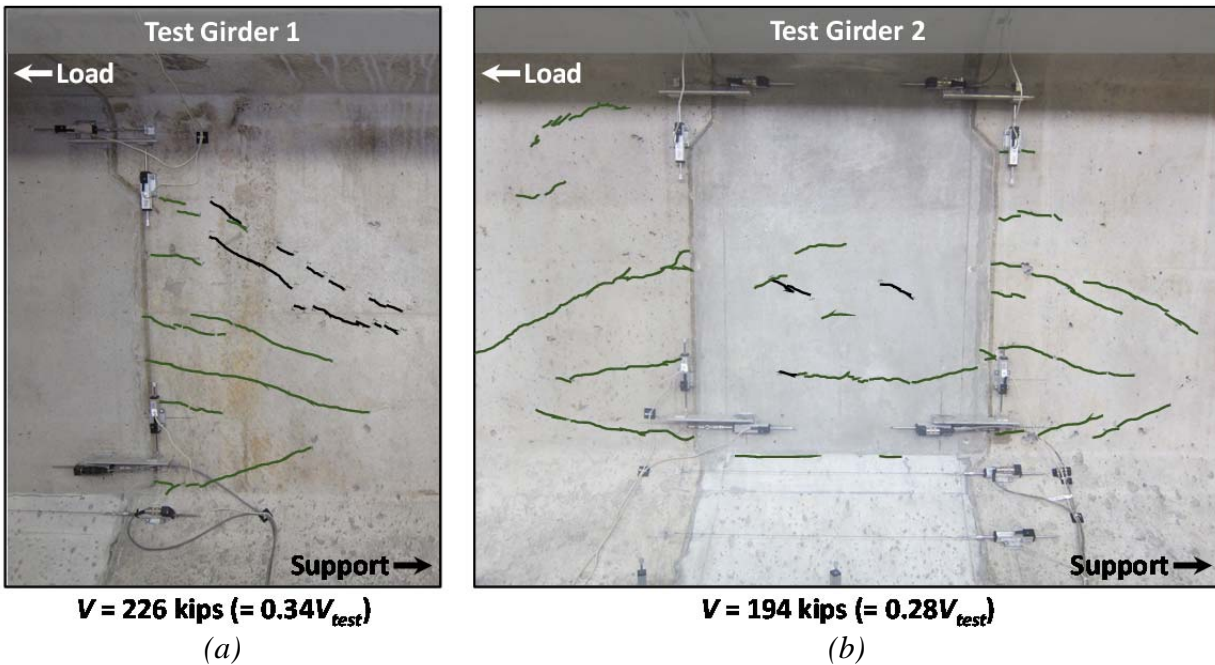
First cracks during load tests – (a) Test Girder 1; (b) Test Girder 2
